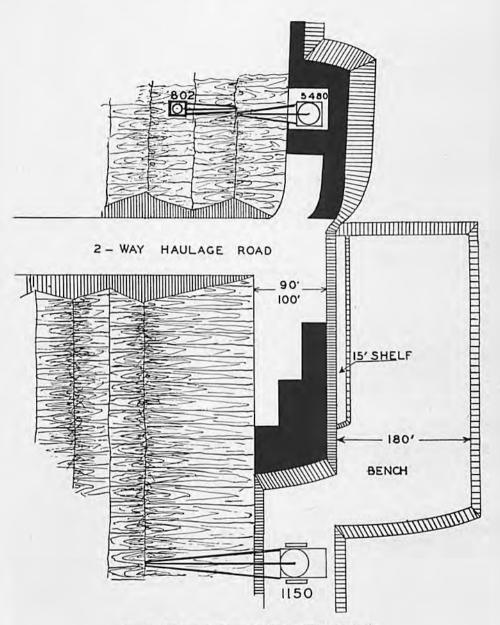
Pit layout-Maumee Collieries, Chieftain Mine
